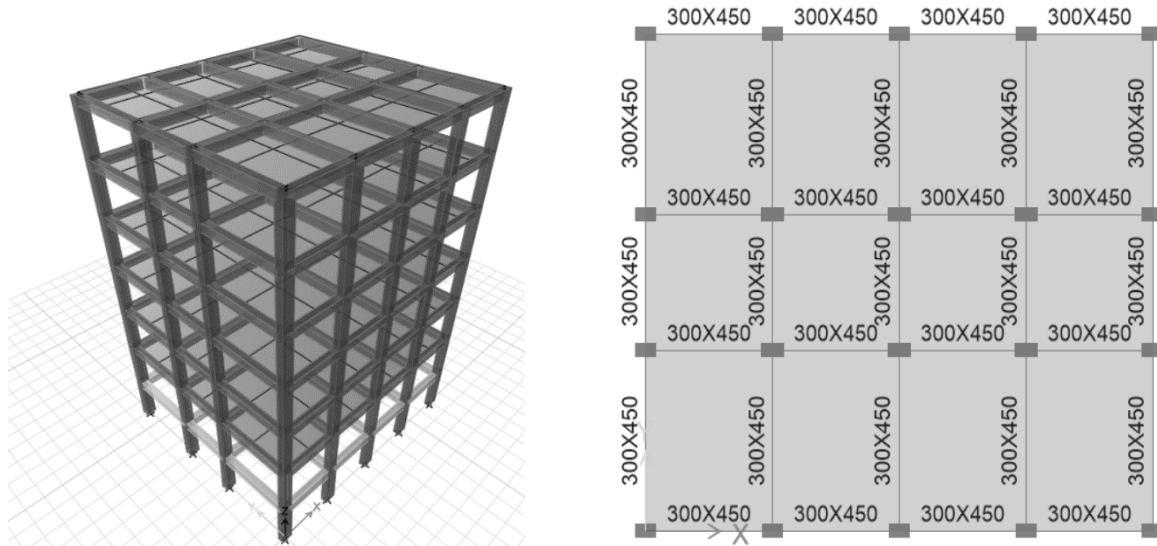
(a) 3-Dimensional model of the building (b) Plan view of 1<sup>st</sup> Floor of the Building
